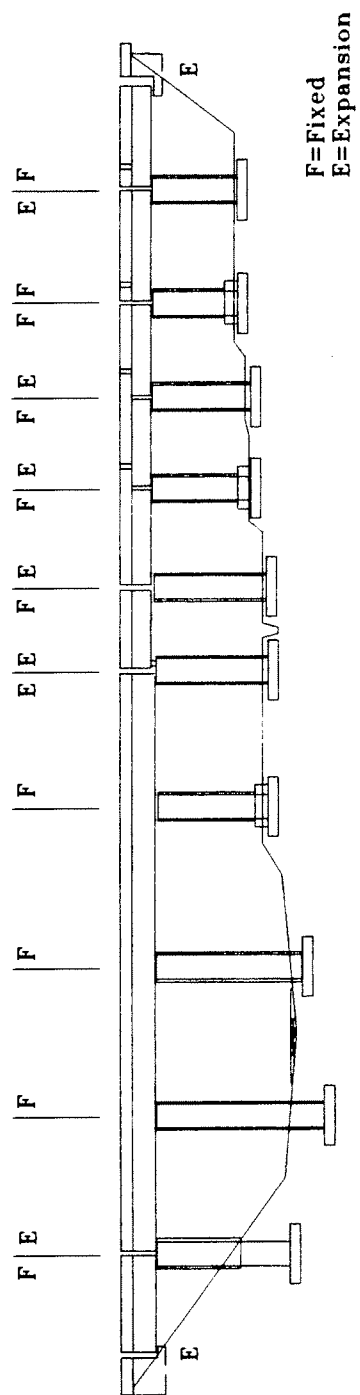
"G-772 W" Bridge Plan And Elevation
